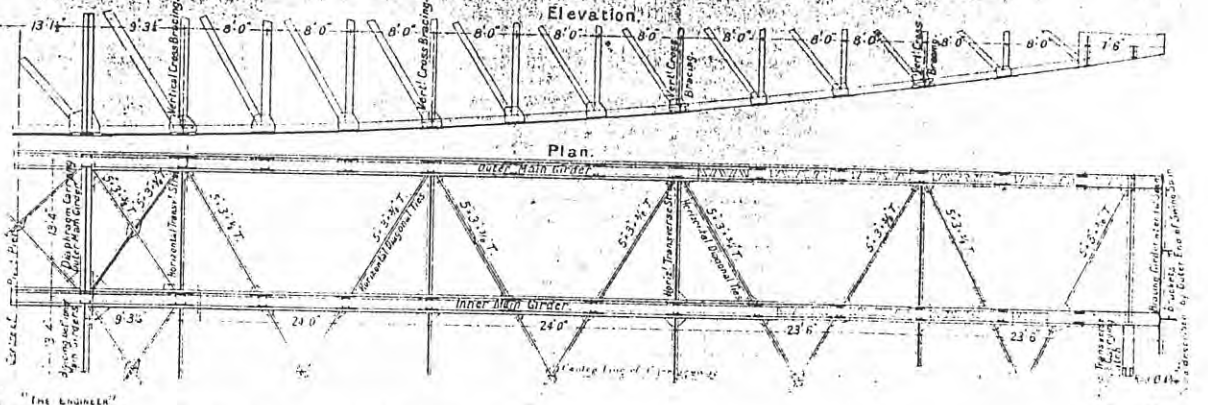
ARRANGEMENT OF HORIZONTAL STRUTS AND DIAGONAL TIES IN BOTTOM BOOMS OF MAIN GIRDERS
